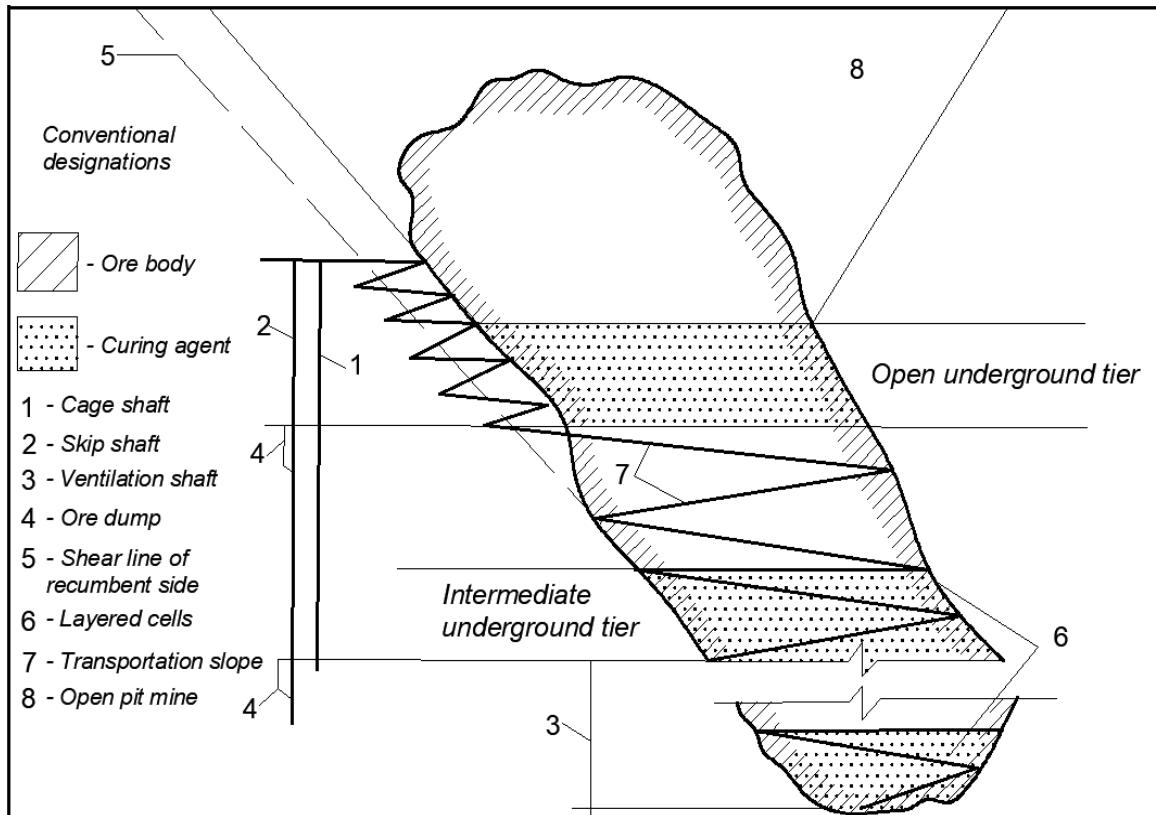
Technological scheme and design of the combined open-underground and underground-underground geotechnology with the ascending development of underground mining operations using layered chambers with hardening backfill
